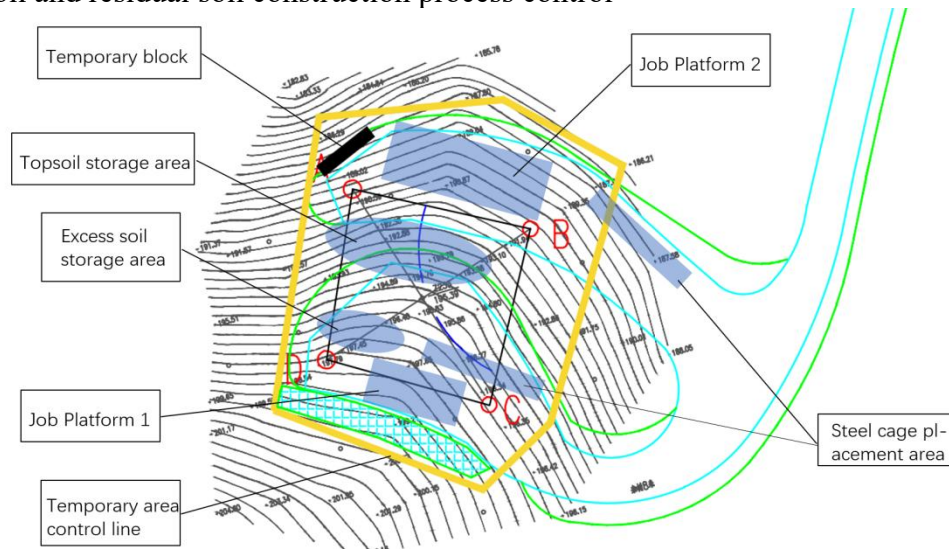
P214 tower foundation excavation and site leveling stage topsoil and residual soil disposal design diagram
